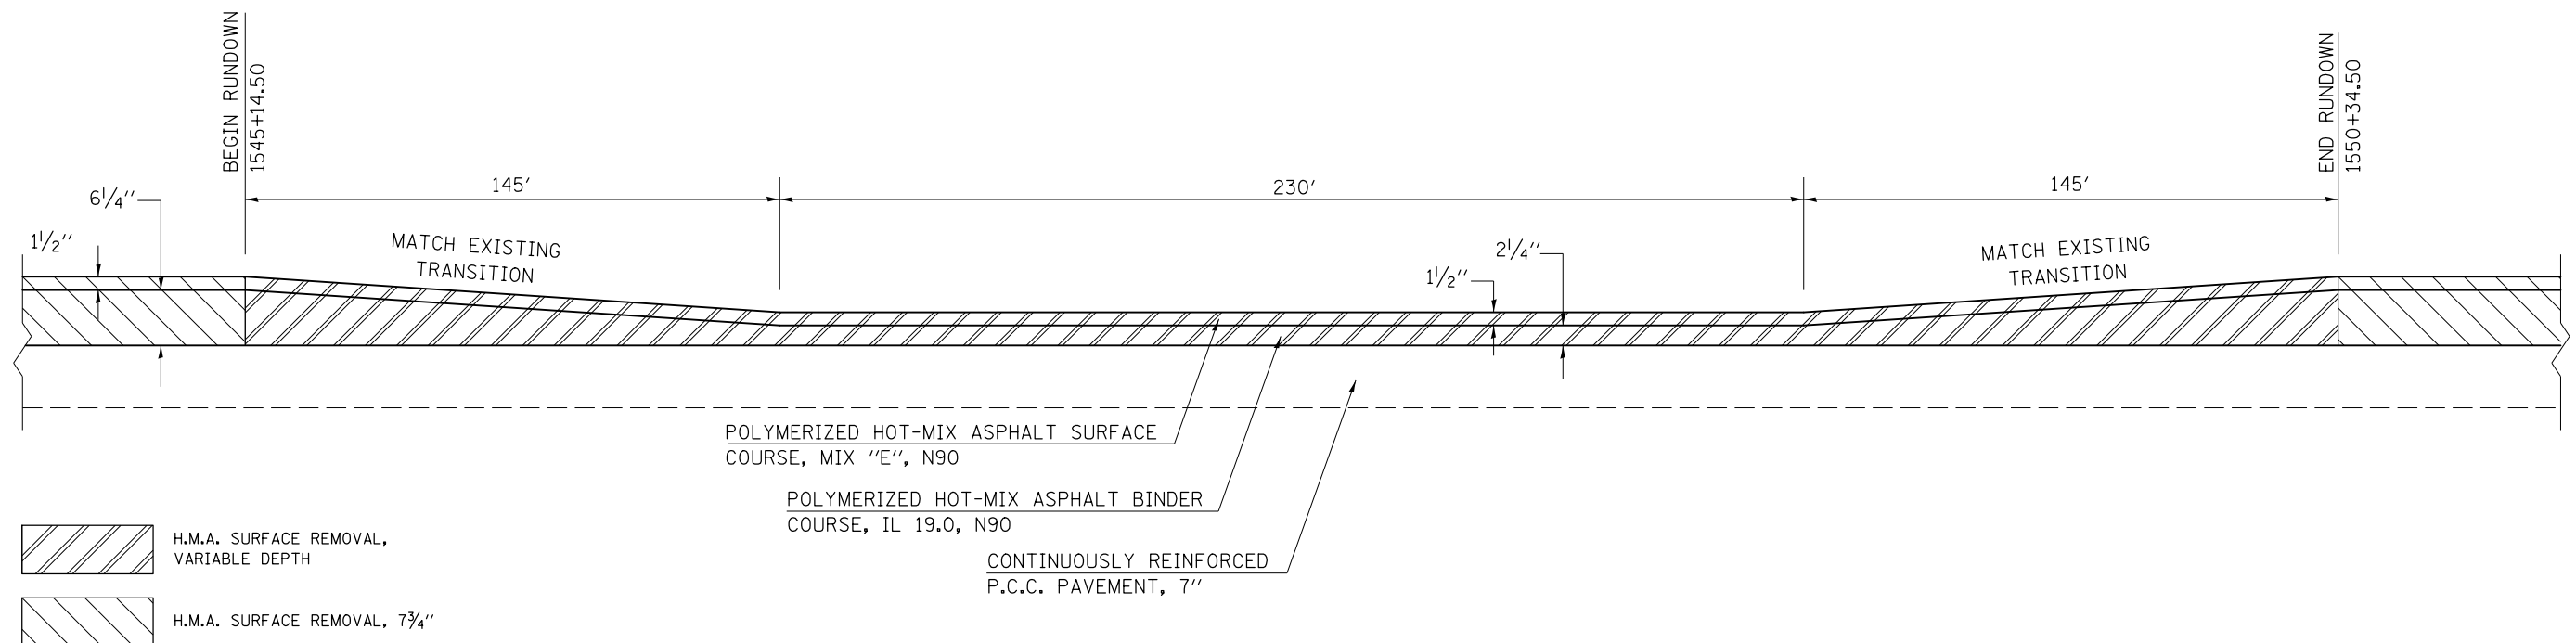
DETAIL OF MILLING & PAVING TRANSITION AT S.N. 010-0289
